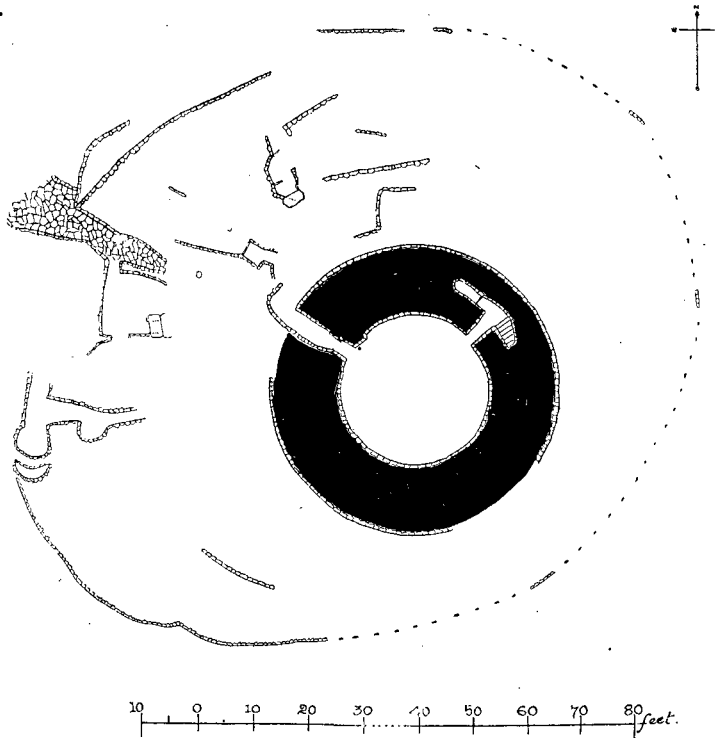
Ground Plan of the Broch of Wester and its outbuildings.
